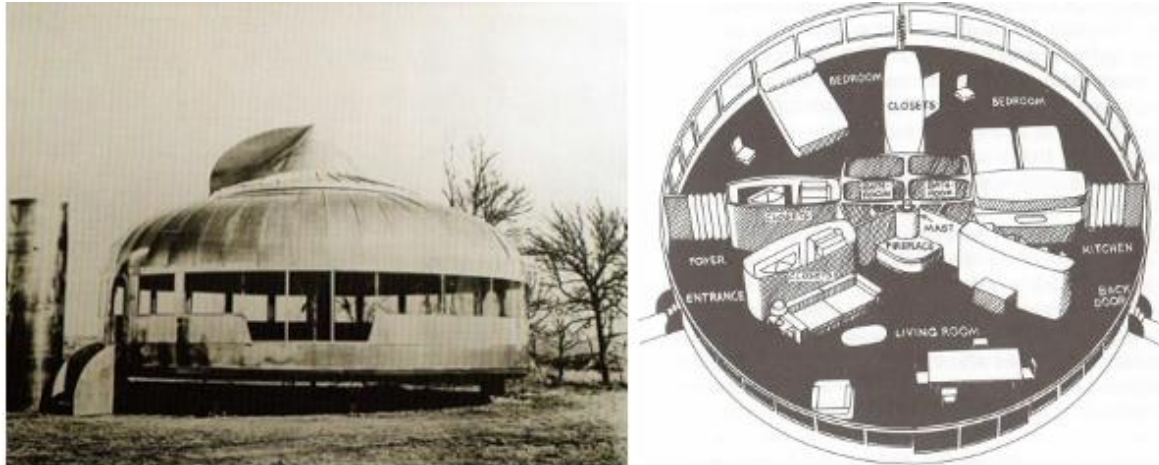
Left: The View of the Constructed Dymaxion House, Right: The Plan of Dymaxion House (Altın, 2013).
